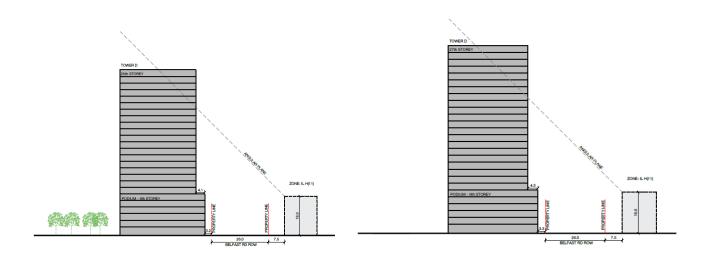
45-degree angular plane applied to Buildings D (left) and C2 (right) from Belfast Road.
